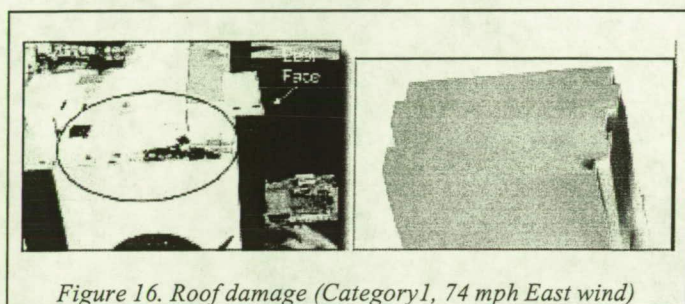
Roof damage (Category 1, 74 mph East wind)
